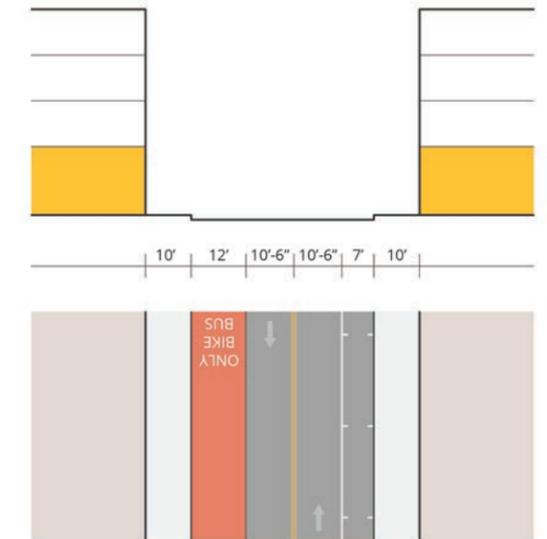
MERIDIAN STREET BETWEEN PRINCETON STREET AND SARATOGA STREET - PROPOSED CONDITION
